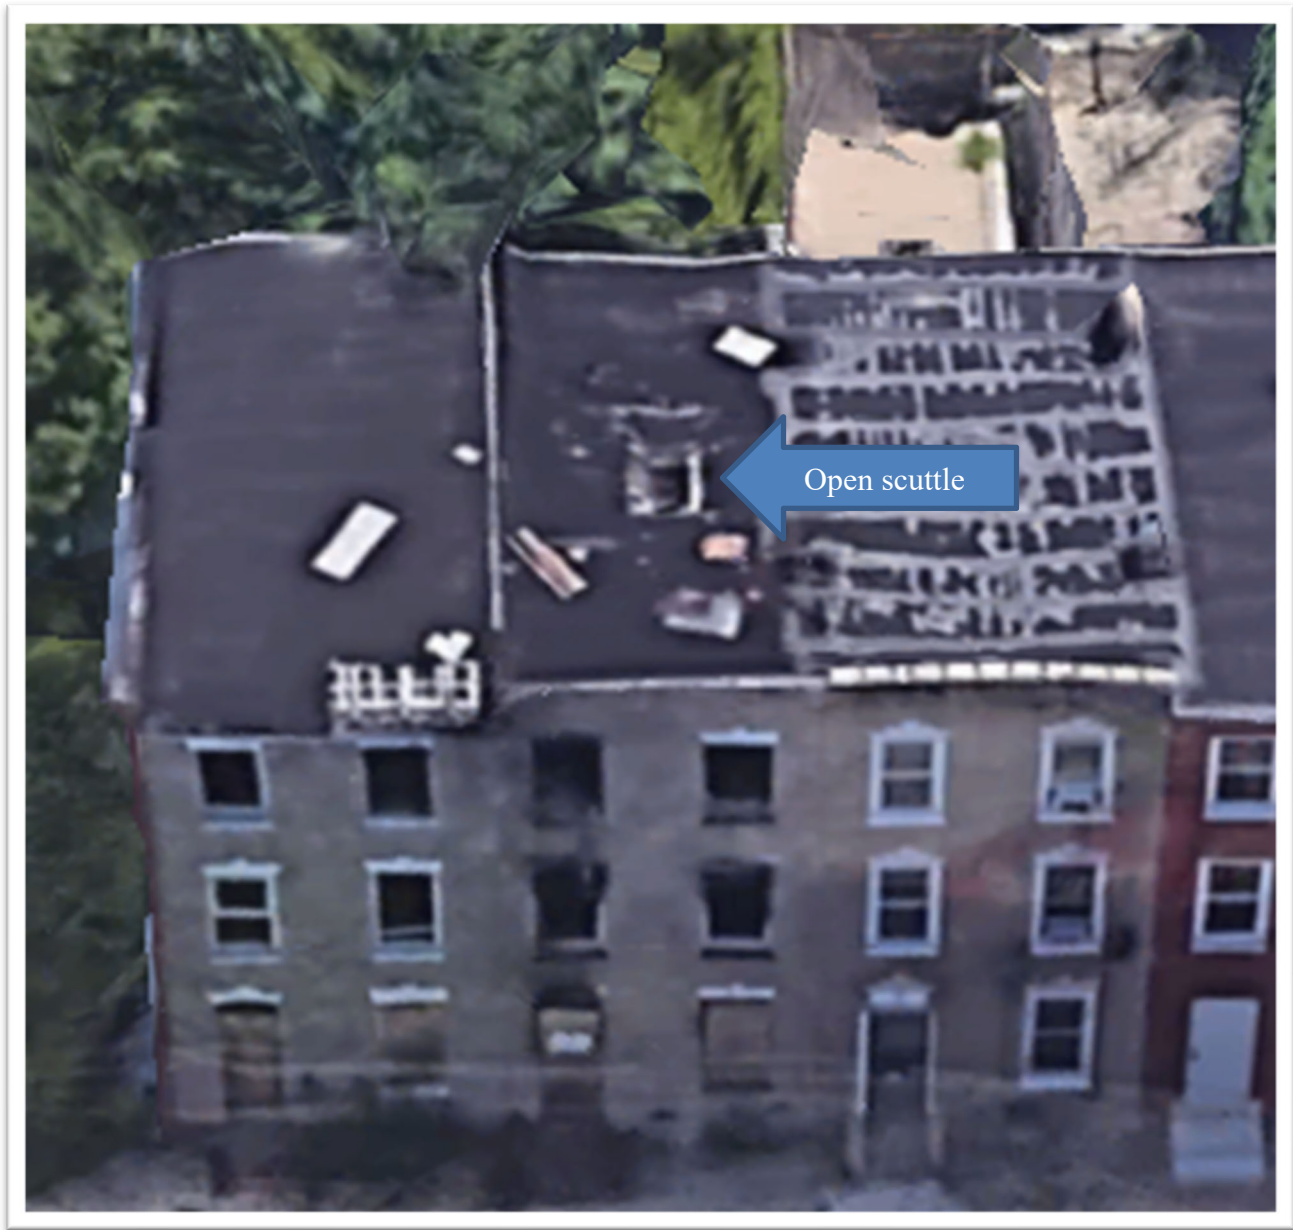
205 South Stricker Street, roof of fire building showing a scuttle opening from previous fire in 2015 (Google Map)
